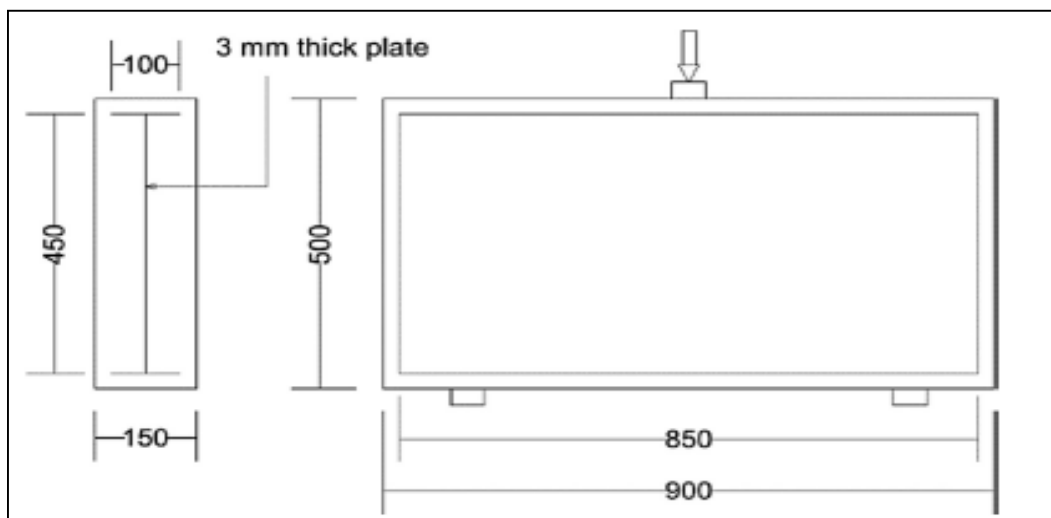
Cross section and the embedded I-section steel plate [44]
